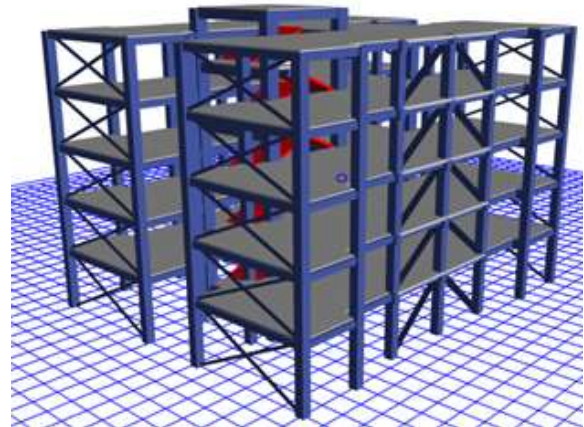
Optimum solution for usage of bracing as retrofit to existing building
